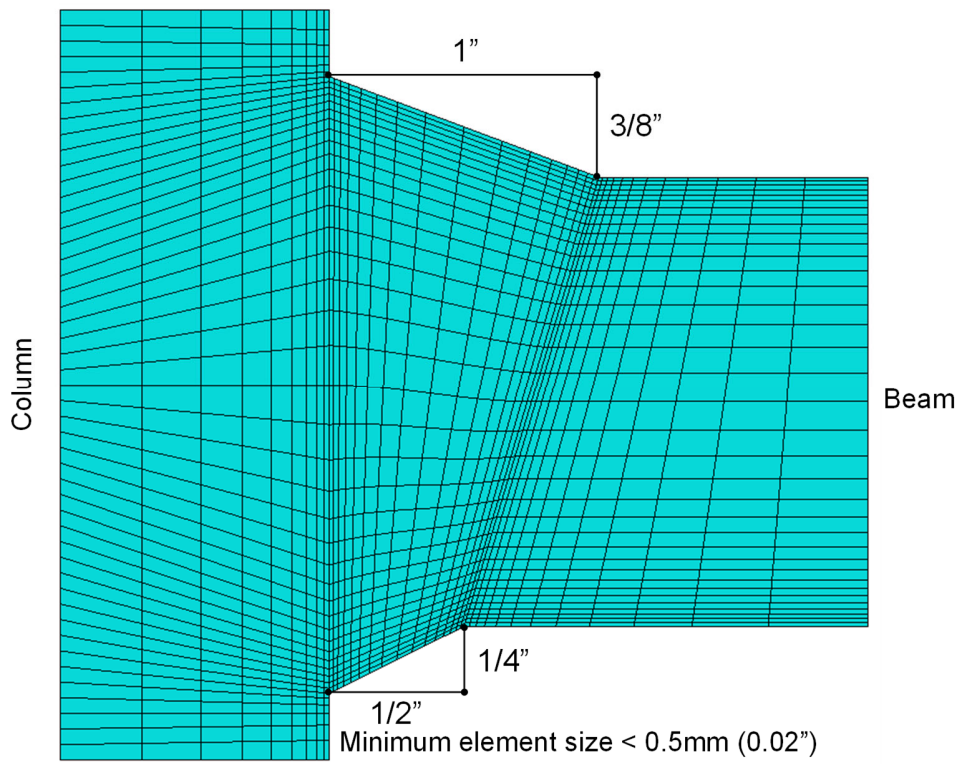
Weld of lower beam flange geometry and mesh (Issue 3)
